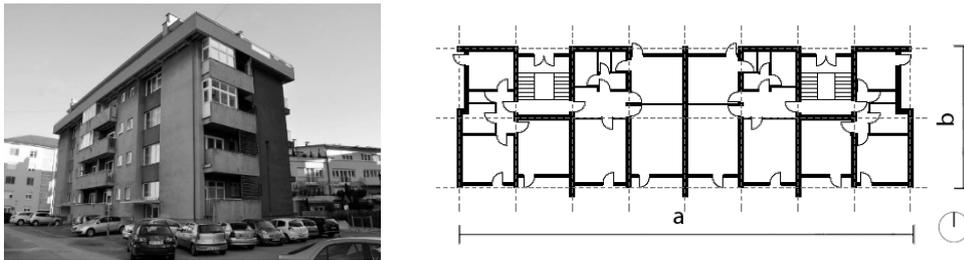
Existing case study building – EB B (left) and its floorplan (right)
